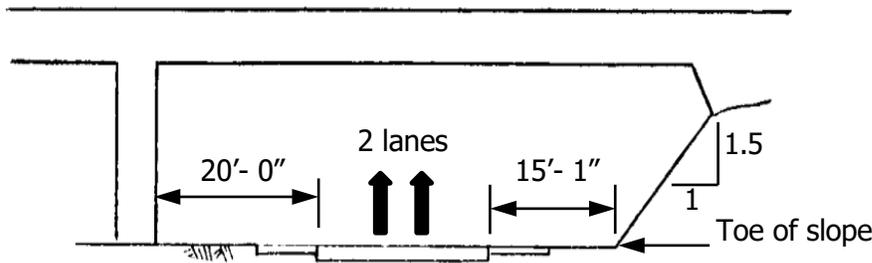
Bridge elevation view of horizontal clearances for a 2-lane highway feature with 1-way traffic below the bridge.
